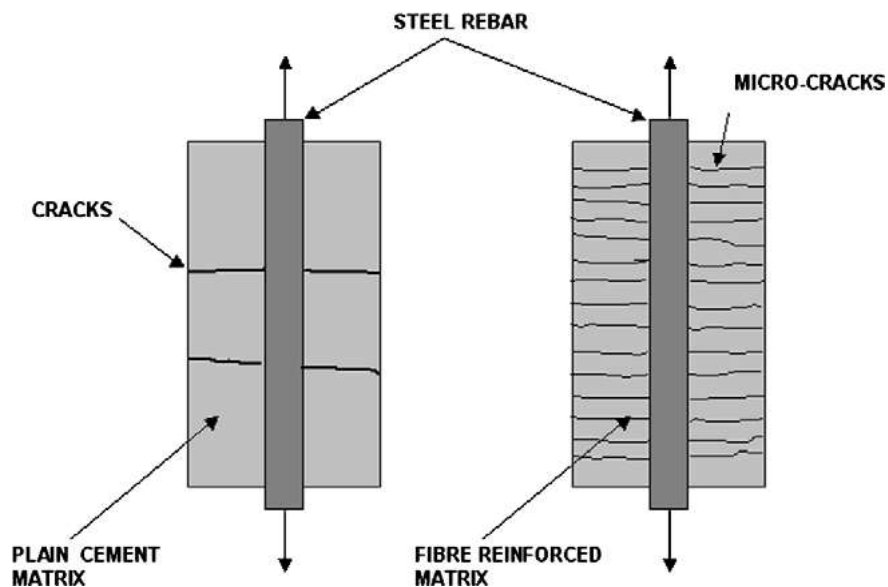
Crack pattern in reinforced concrete (RC) and fibre reinforced concrete (FRC) elements subjected to tension (After Brandt, 2008)
